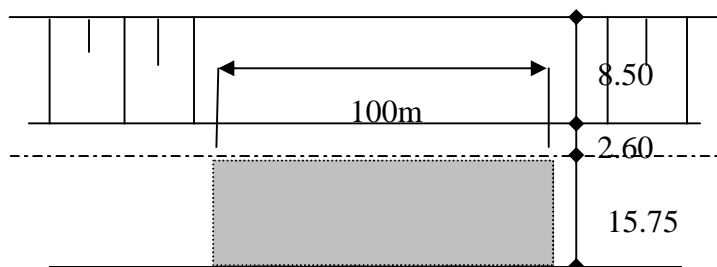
Shoulder Ditch on Cut Section DS (M)-C
